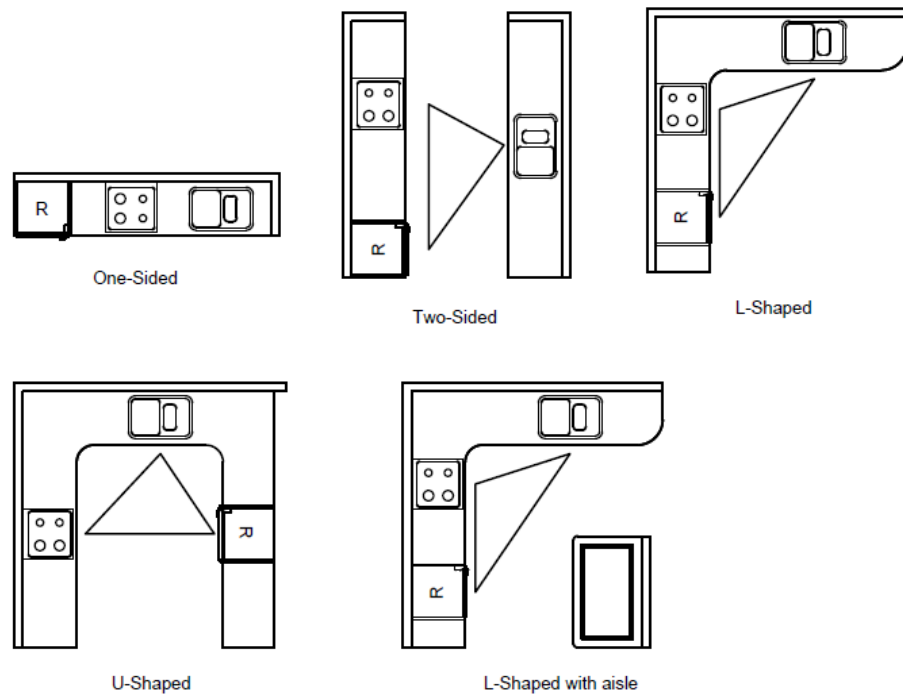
Sketch Drawings of Kitchen Layout Types (drawn by author, 2016).
